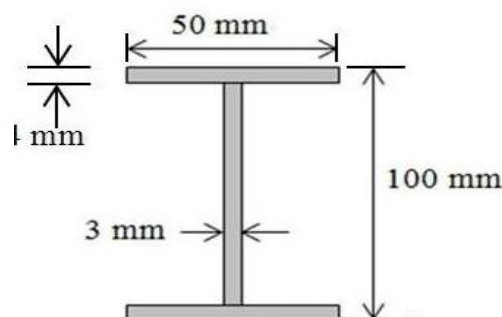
CROSS SECTIONAL DETAILS OF TESTED I-SECTION
